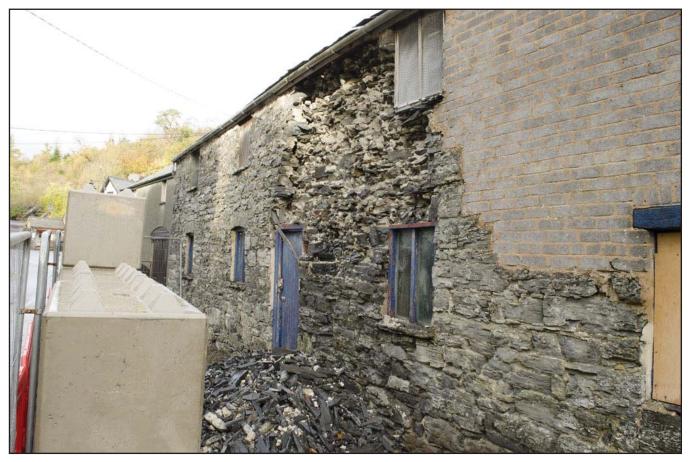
Partially collapsed roadside façade of Block C; scale not used; view from SSE (archive reference: G2750_008).
